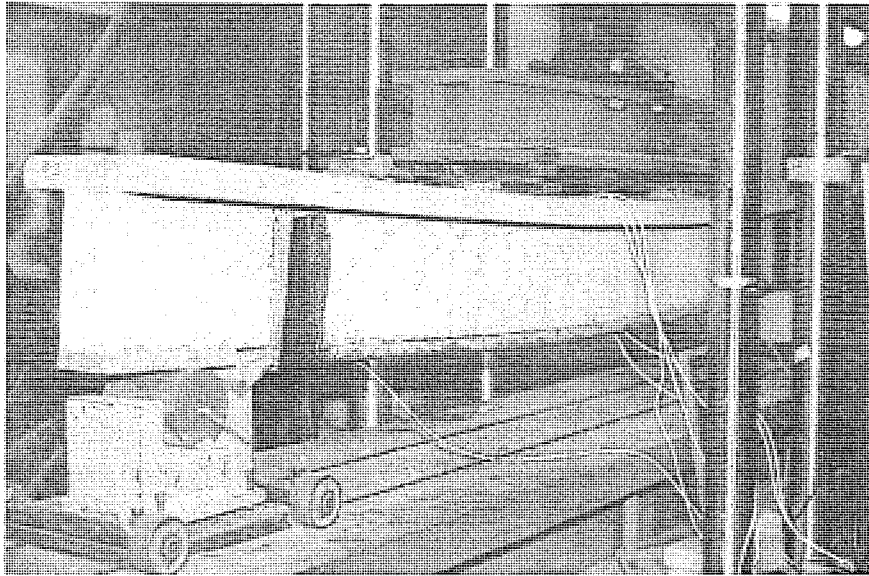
Interfacial bond failure of CFRP sheet in Beam No. 9.
